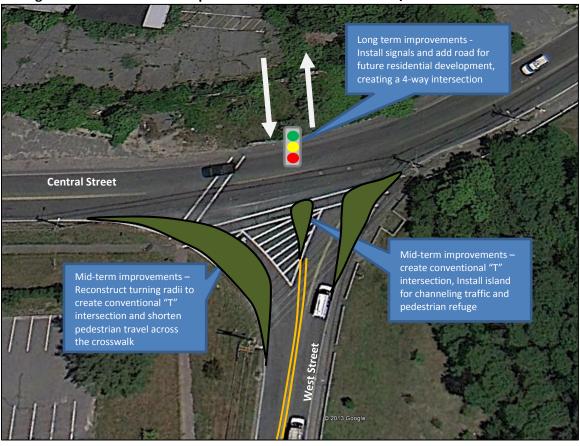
Recommended Improvements to the Central Street/West Street Intersection
